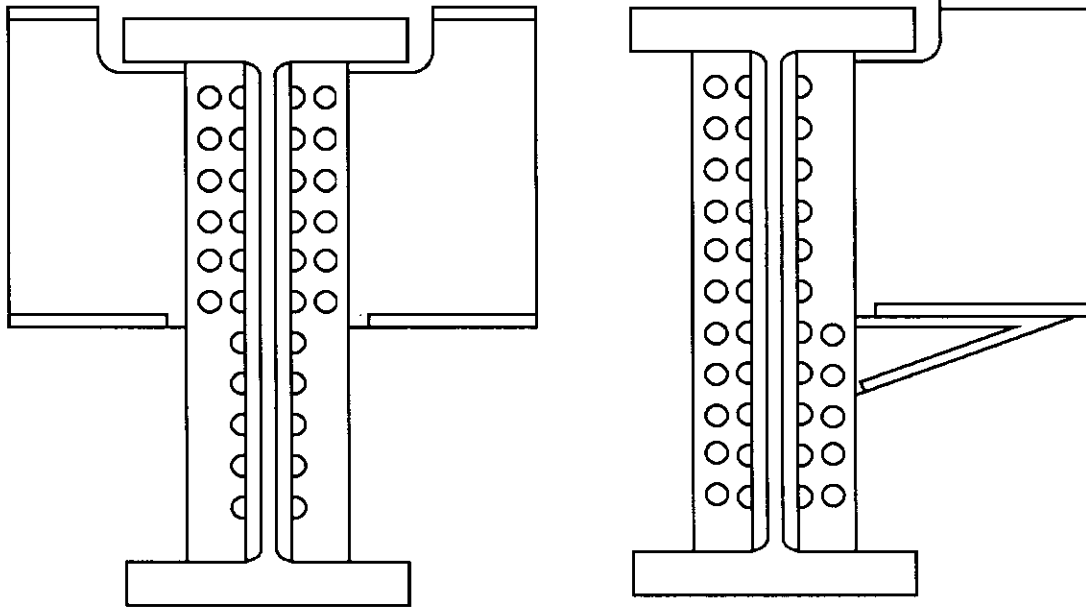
Typical Layout of Structural System for the Deck of Steel Truss Bridges
